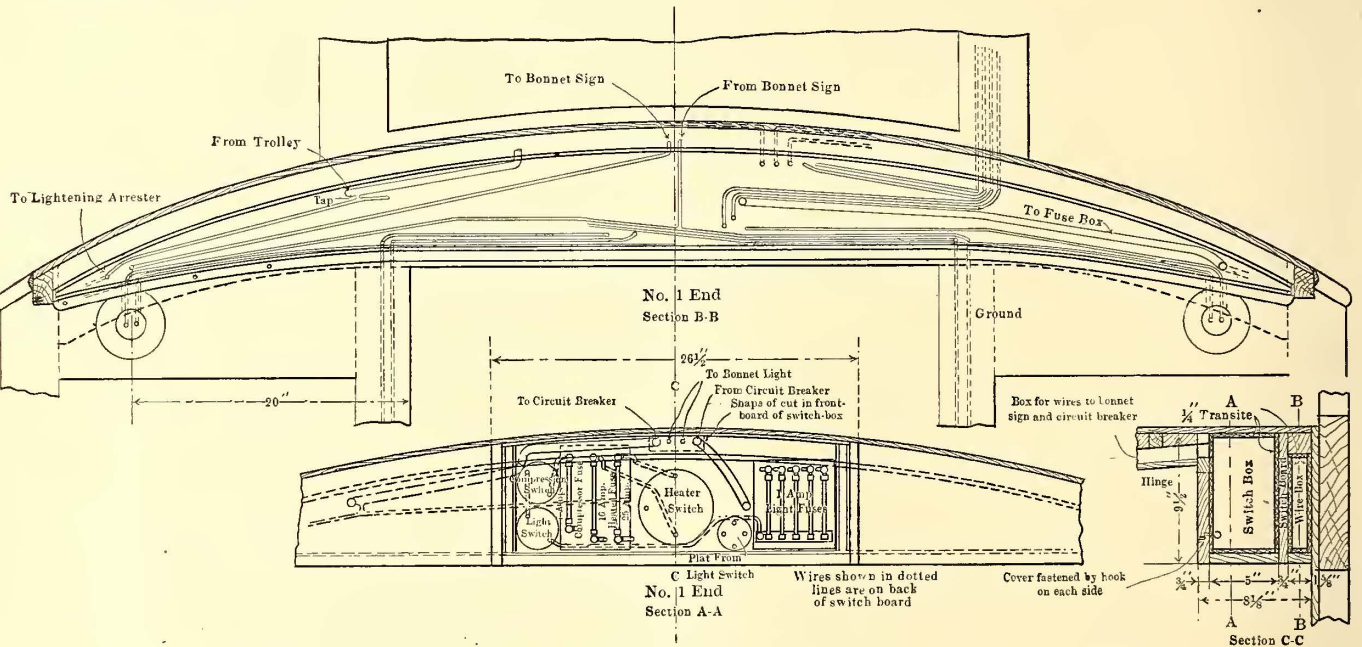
SECTIONS AT NO. 1 END OF CAR, SHOWING WIRING, SWITCH AND WIRE BOXES
